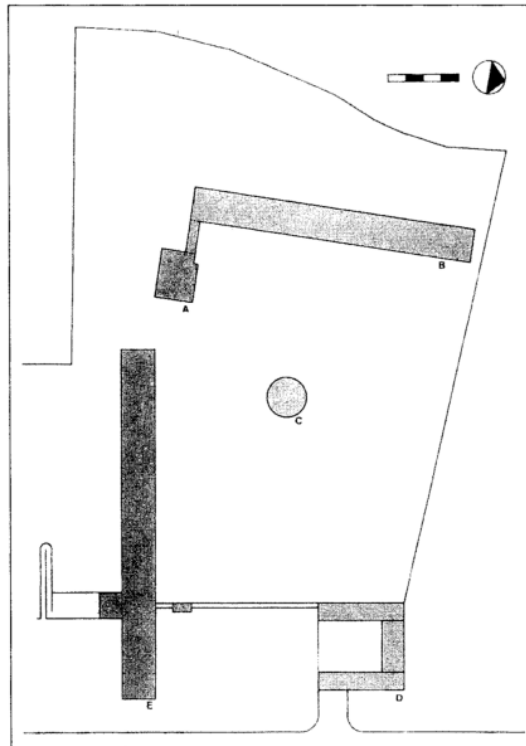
The site plan of Narkomfin. Source: thecharnelhouse.org
